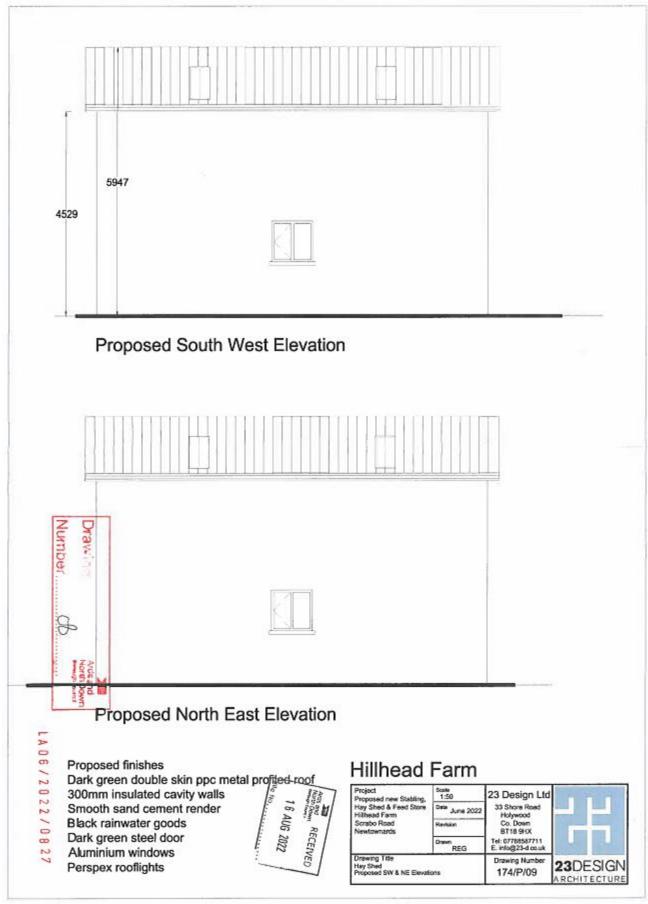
Proposed Hay Shed and Tack Store Elevations
